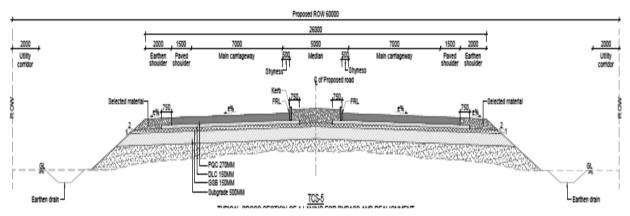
TCS-5 Typical Cross Section Of 4-Laning for Bypass and Realignment
